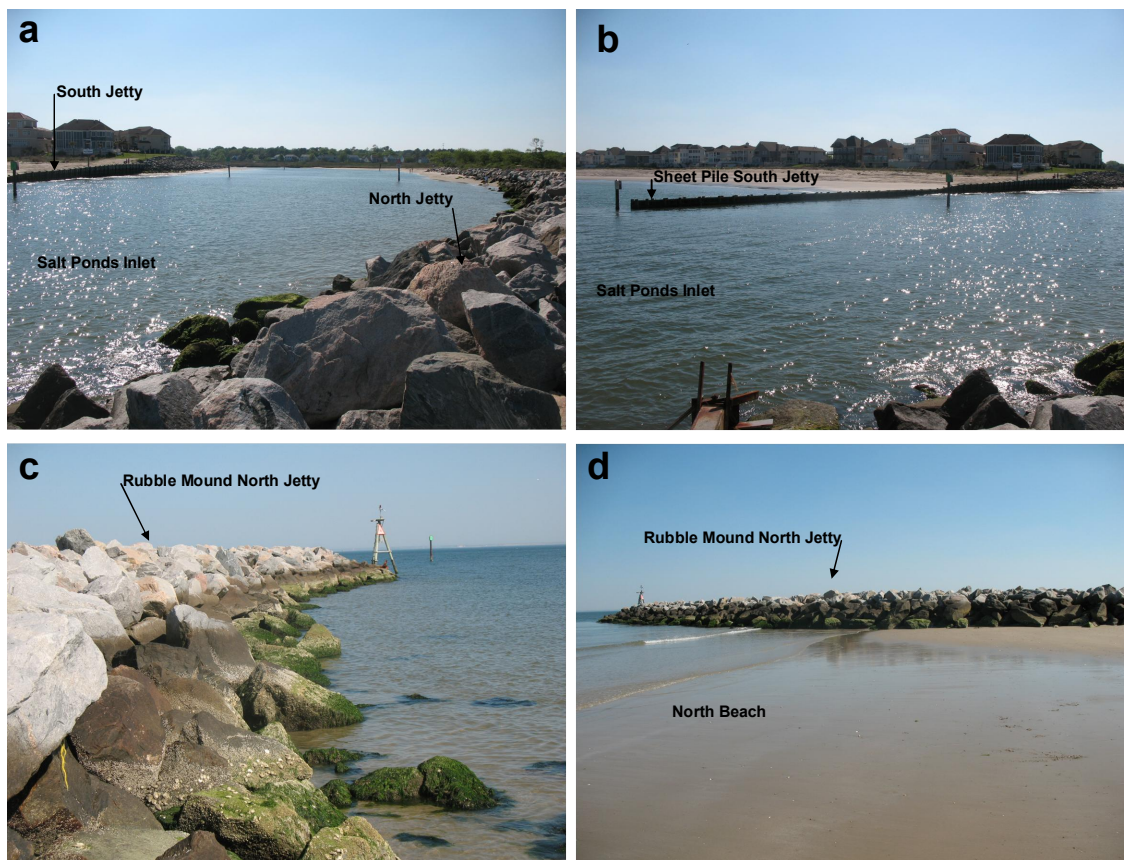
Recent Photographs of Salt Ponds Inlet. a. View looking into the inlet. b. View of the sheet pile south jetty. c. View of the rubble-mound north jetty details. d. View of the north jetty from the north.
